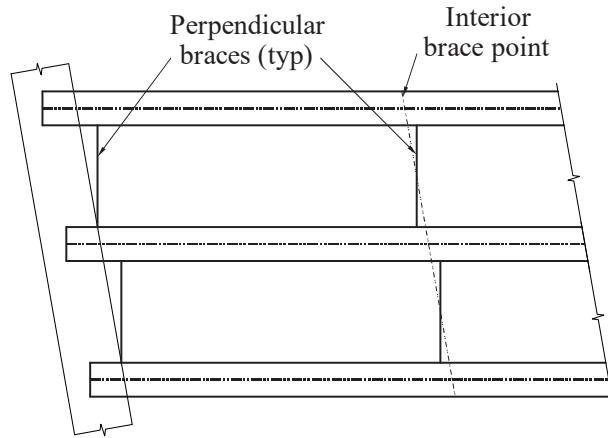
Perpendicular brace placement on skewed bridge (plan view)
